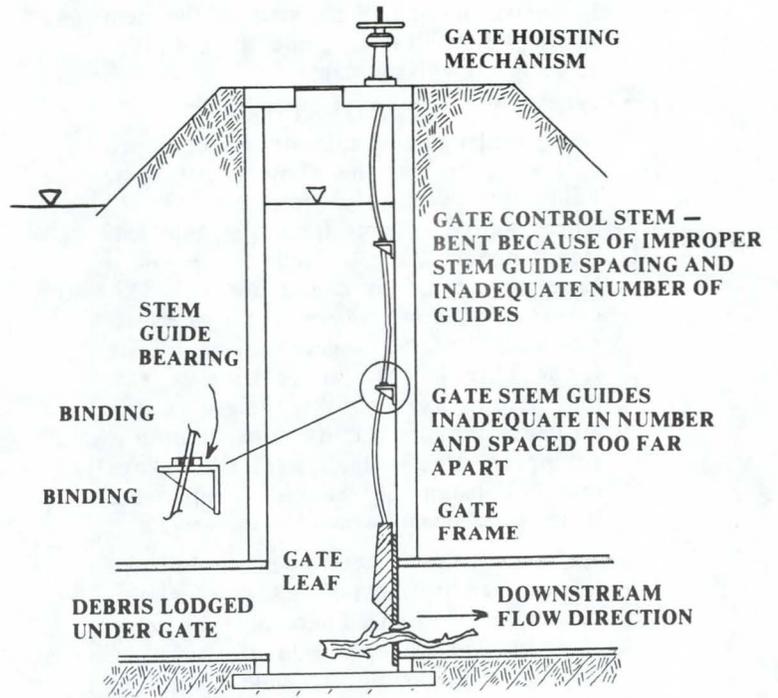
WET WELL OUTLET INSTALLATION
